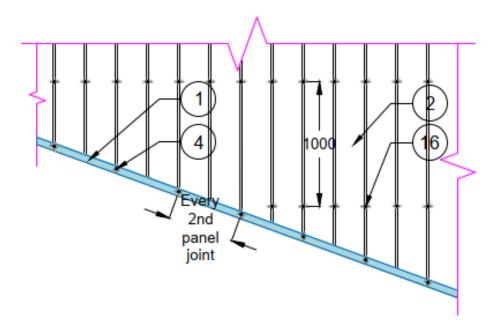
Vertical Speedpanel wall connected to stair stringer (elevation view)
